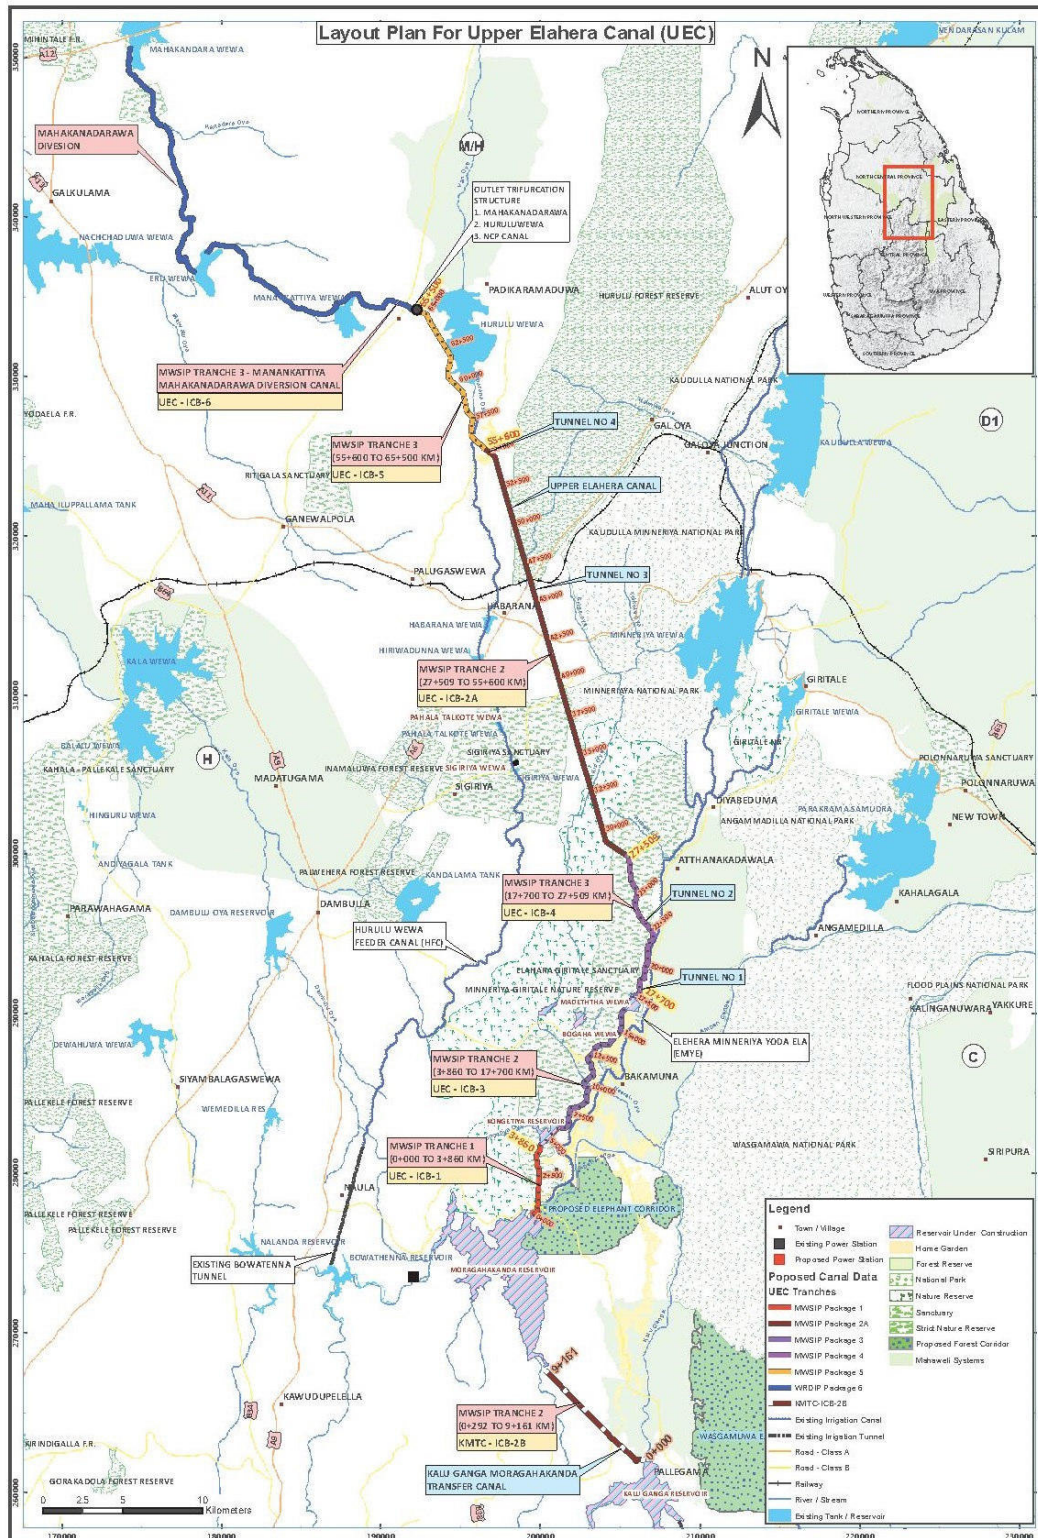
Overall Layout Plan for Upper Elahera Canal
